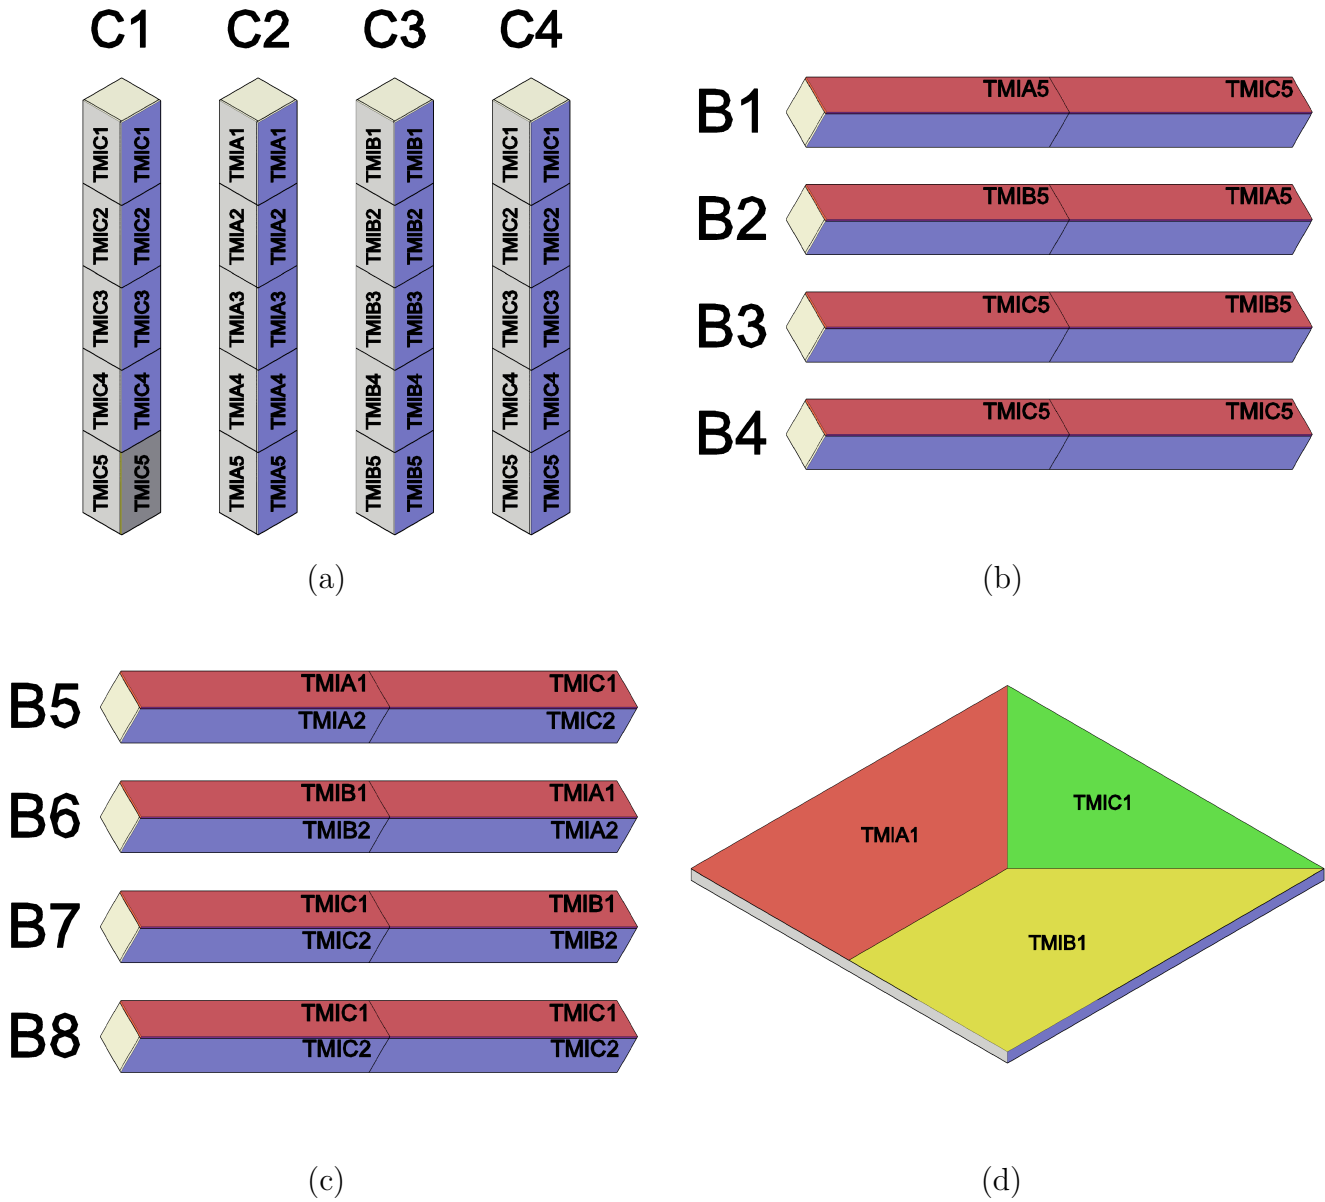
Surface temperatures considered for heat transfer analysis (a) Columns (b) Floor beams (c) Roof beams (d) Slab
